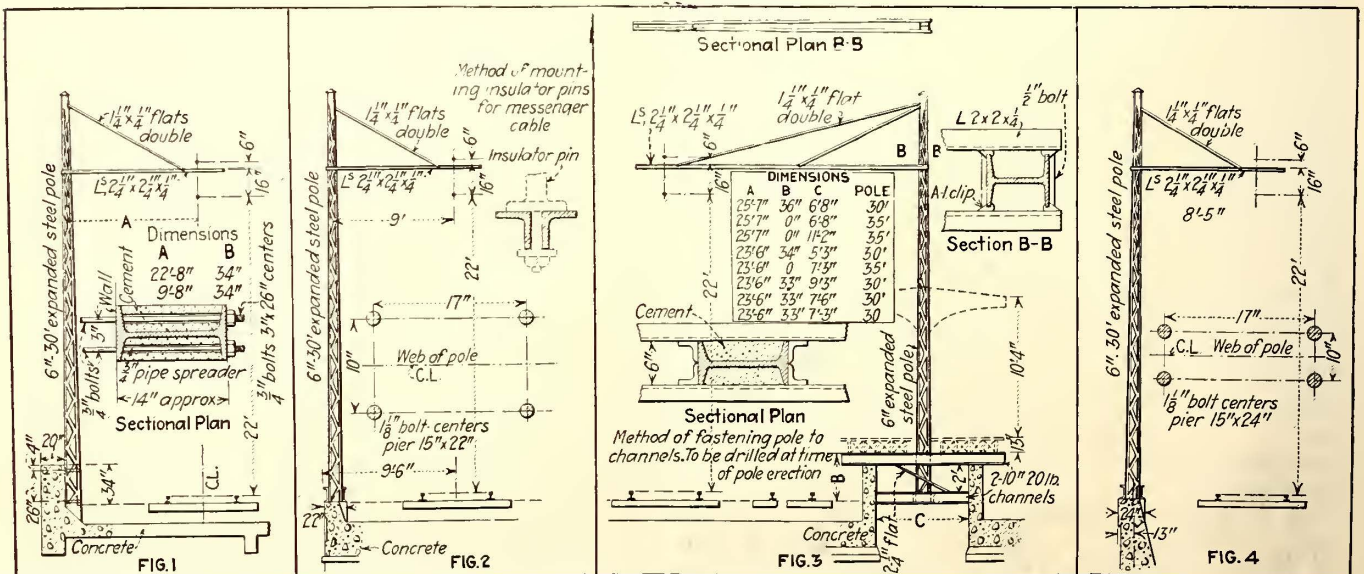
METHOD OF SETTING STEEL TROLLEY POLES ON BRIDGES WHERE SIDE GIRDER EXTENDS ABOVE TRACK LEVEL. FIG. 2—METHOD OF MOUNTING POLES ON CURBING WHERE THERE IS A SLAB CONSTRUCTION. FIG. 3.—METHOD OF SETTING POLES IN CENTER OF STATION PLATFORM CONSTRUCTION. FIG. 4—METHOD OF SETTING POLE ON TOP OF CONCRETE RETAINING WALL FOR FILLED-IN EARTH ELEVATION
